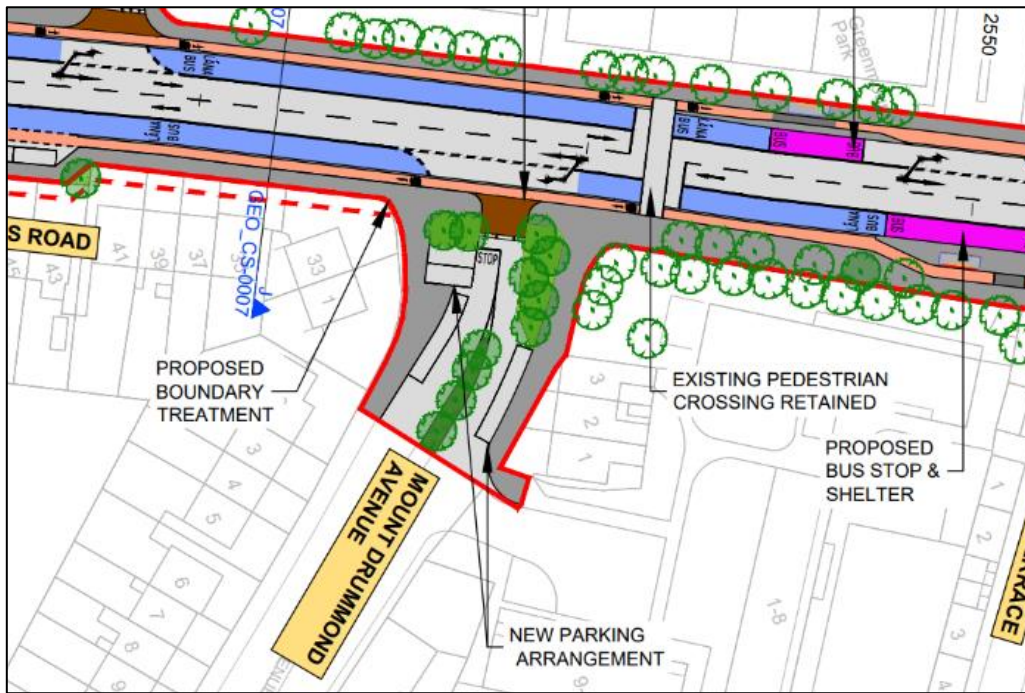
Extract from General Arrangement Sheet 7 at Mount Drummond Avenue
